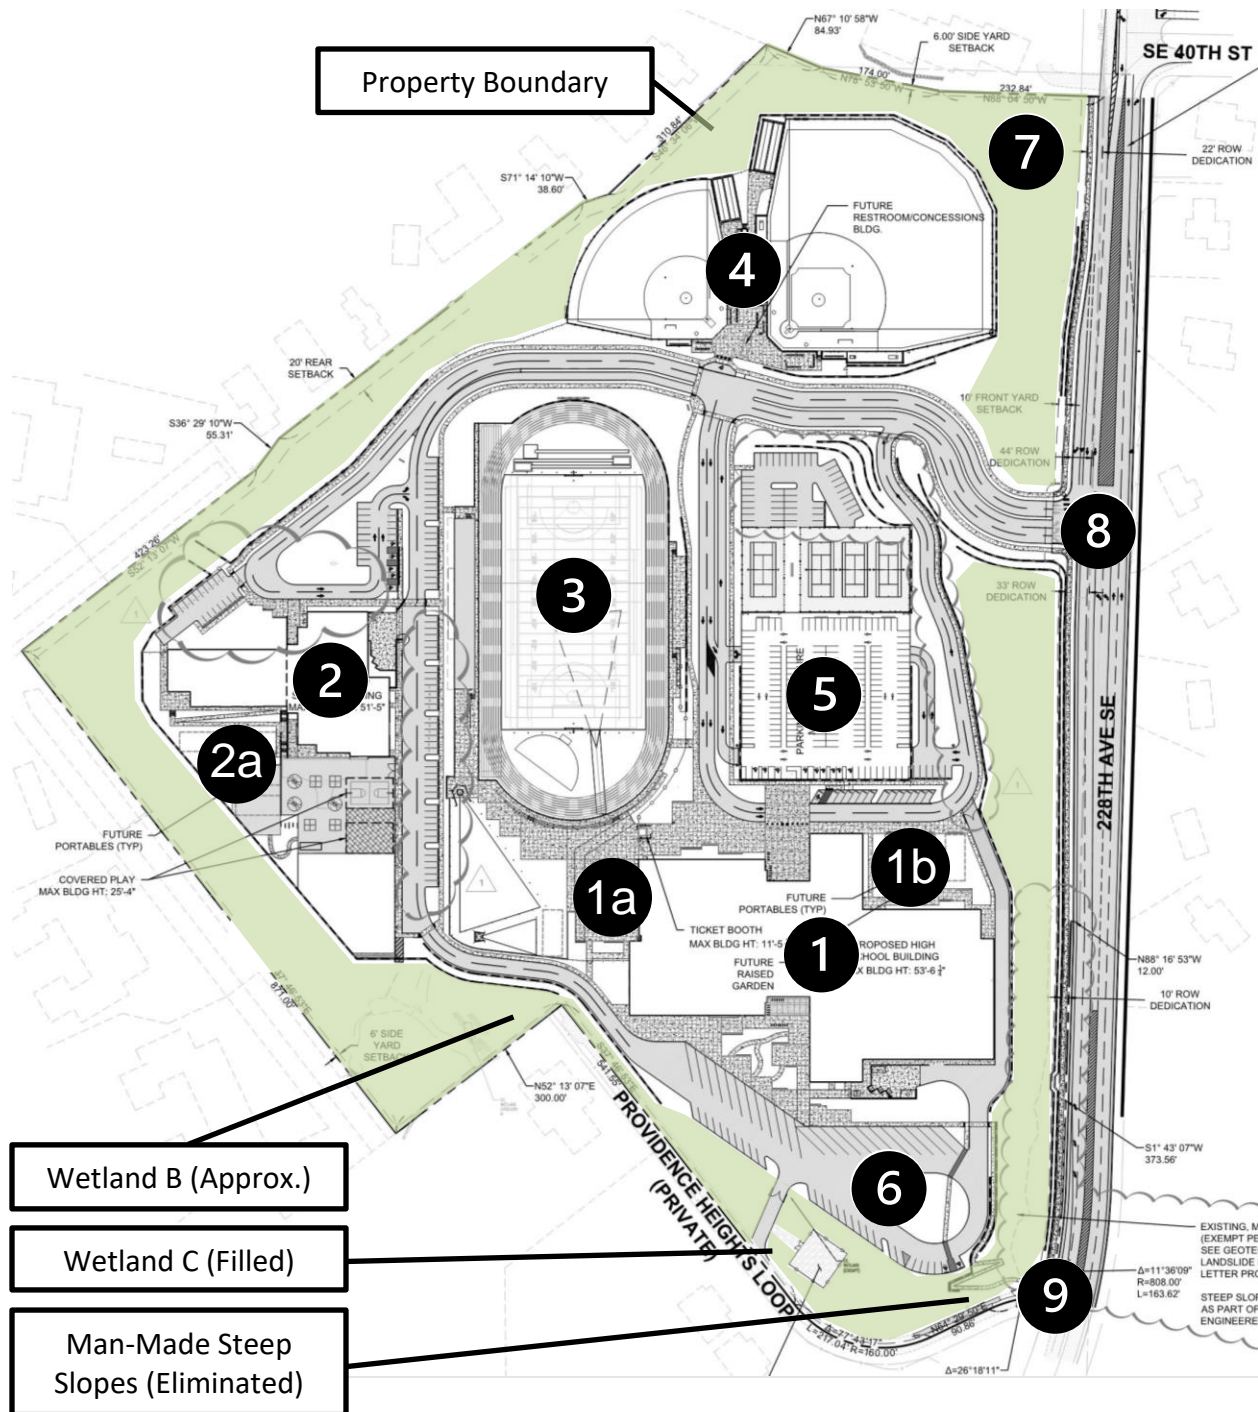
Project Site Plan. Annotations by Staff. Source: ISD (Attachment 97, Sheet C1.0LU – Civil Site Plan).
